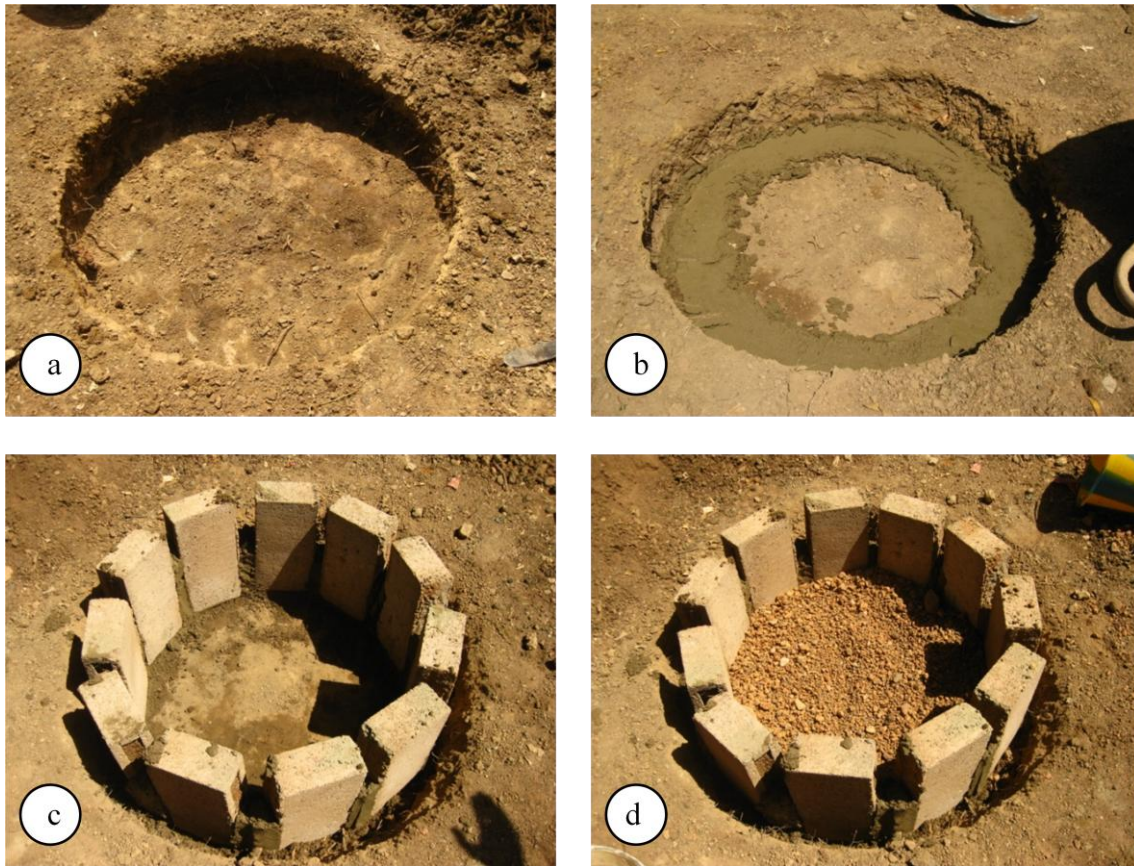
Building the bottom structure of a vertical garden, steps a-d.
